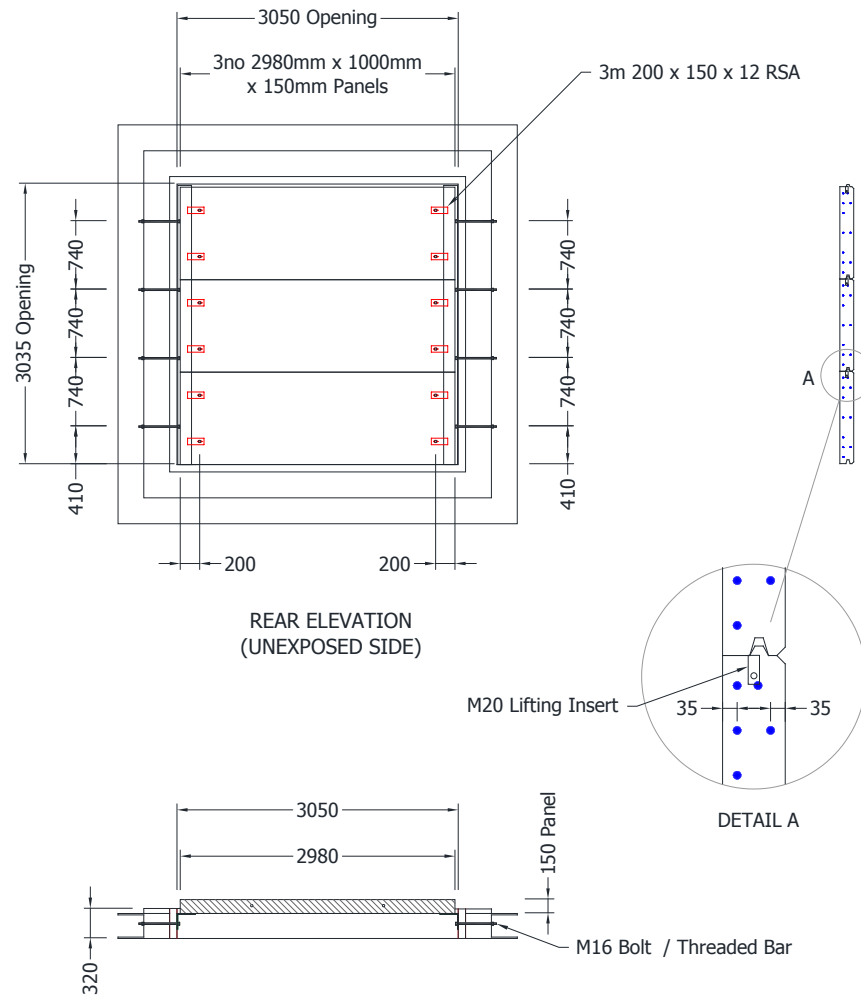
General Elevation of the Unexposed Face of the Test Construction
